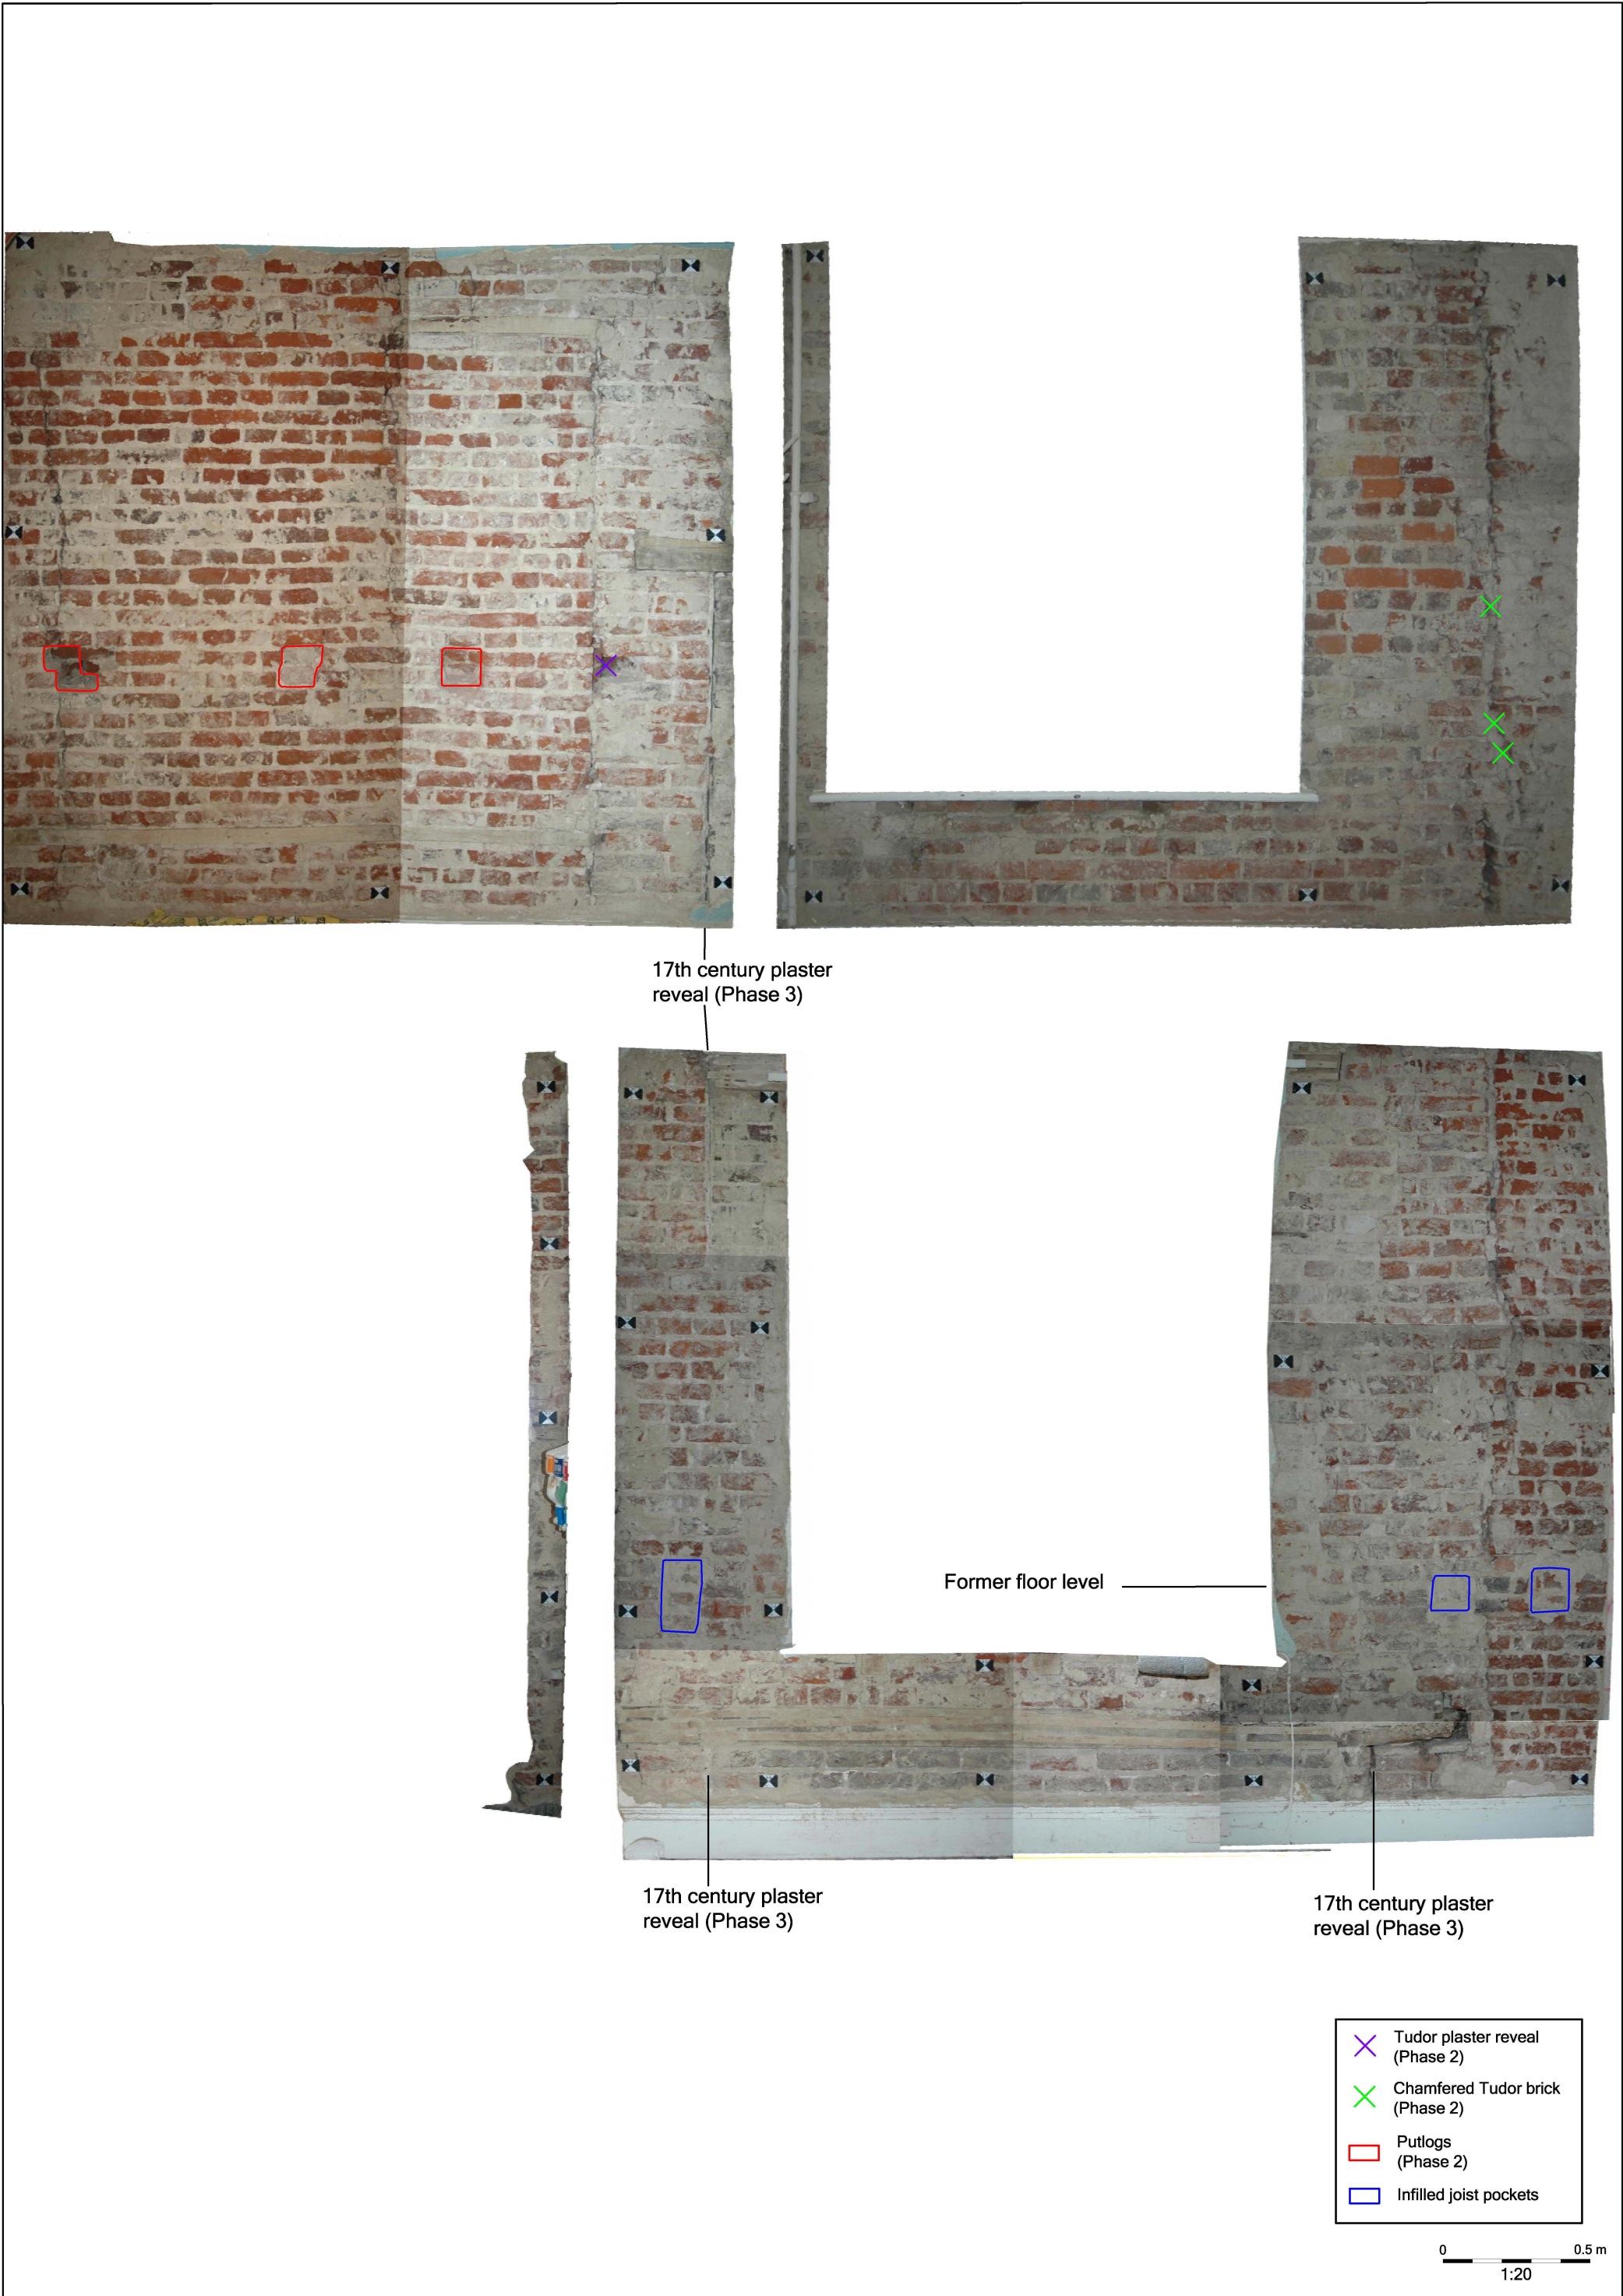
East wall, internal phased brickwork, first and second floor, showing further archaeological detail
